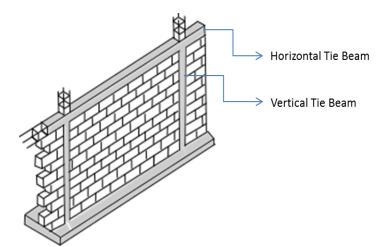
Masonry wall with vertical and horizontal tie beam (By Author)
